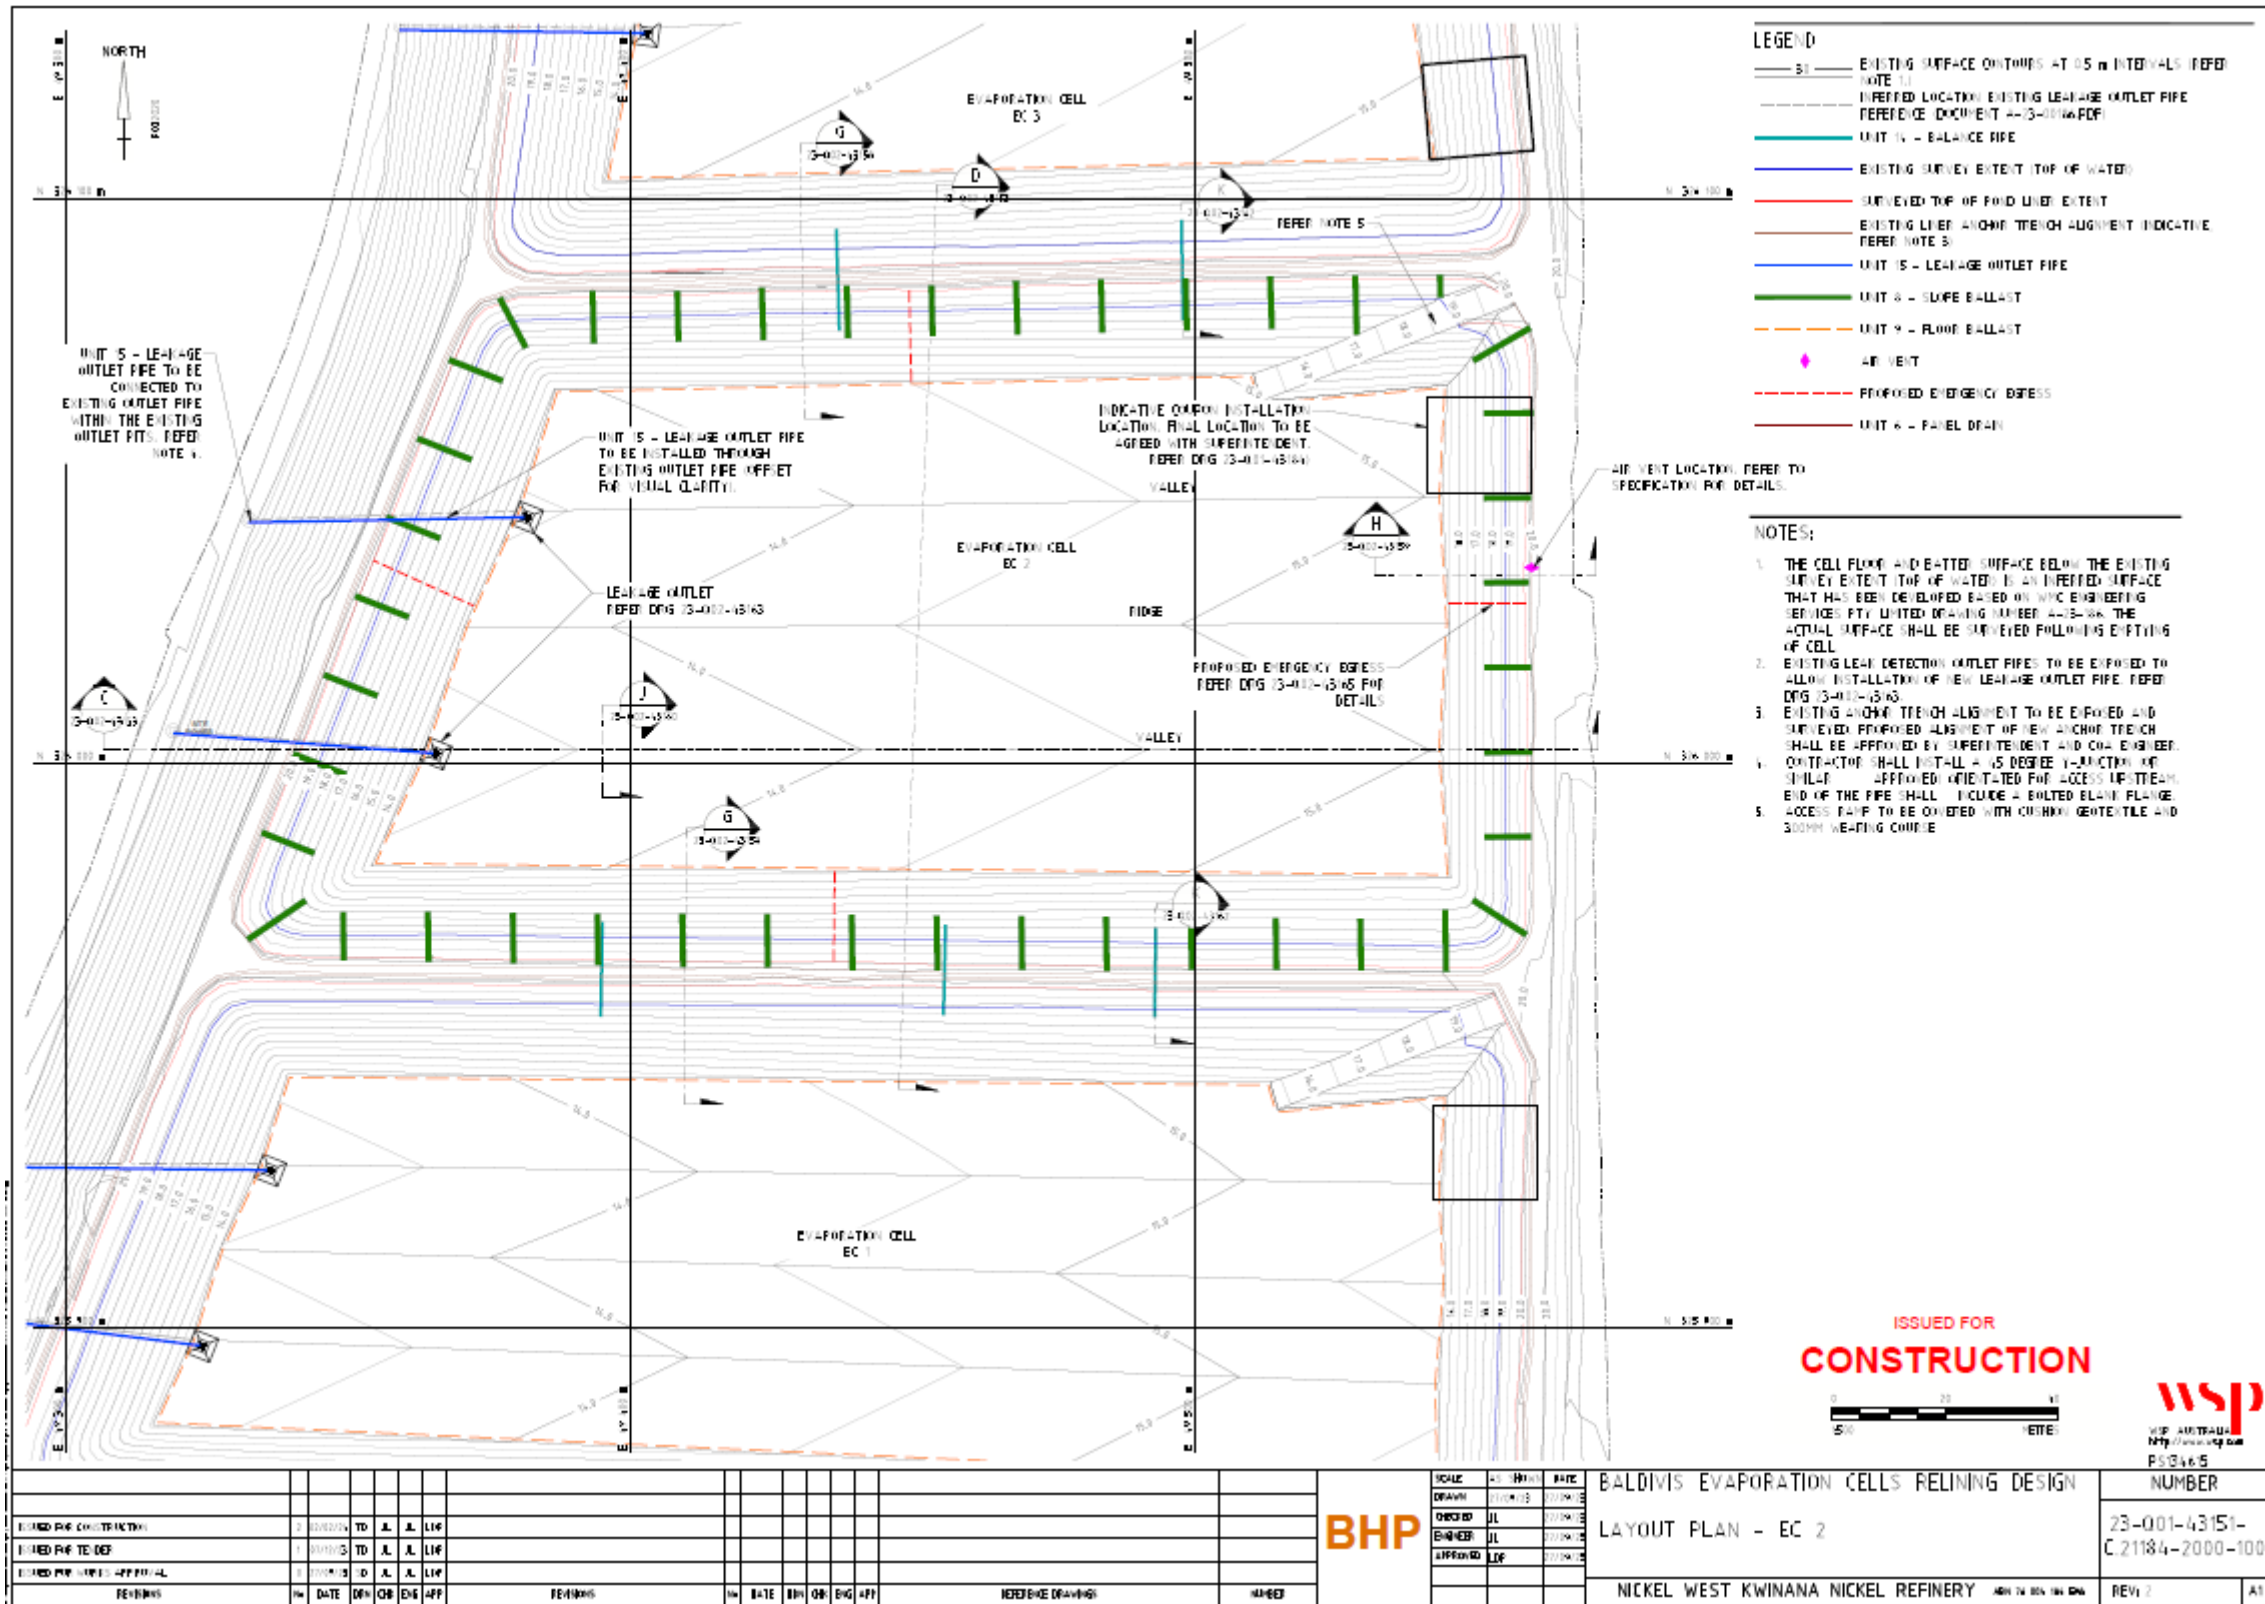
Layout plan for evaporation cell 2 showing access ramp and floor gradient valleys towards leakage outlet pipes
